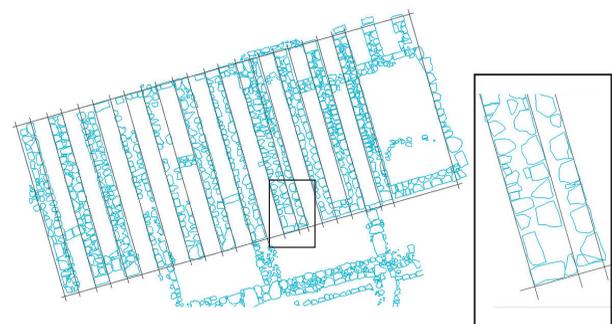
Plan of the foundations walls from the granary, with detail of the enlargement
